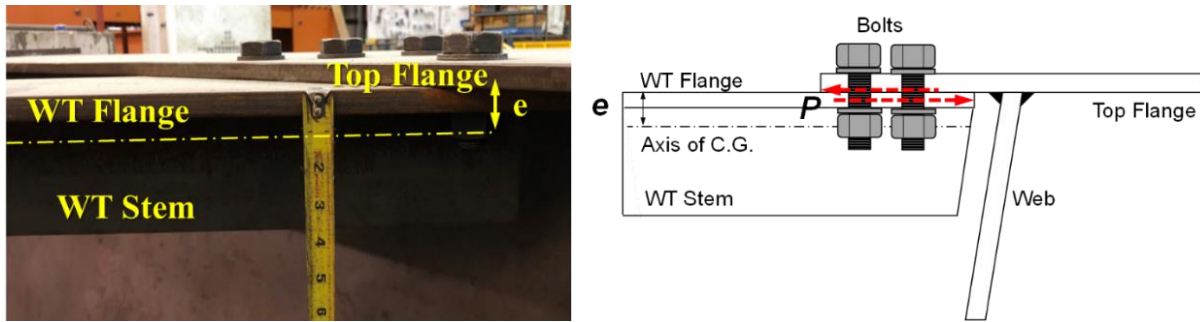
Top Lateral Brace Connection Details in the Test Specimen
